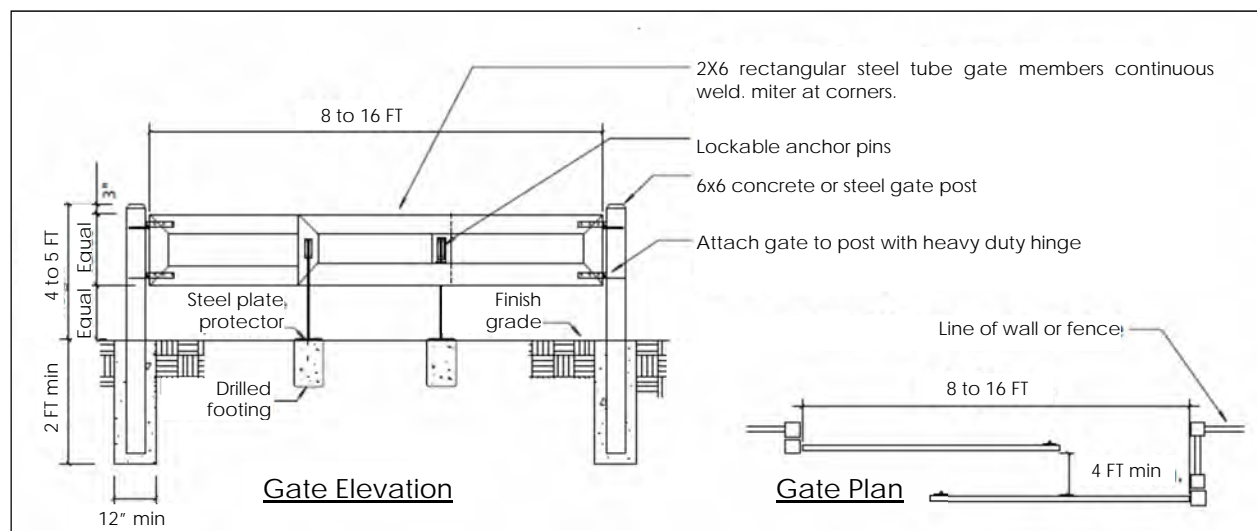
Equestrian Trail Steel Barrier Gate Entry Design
